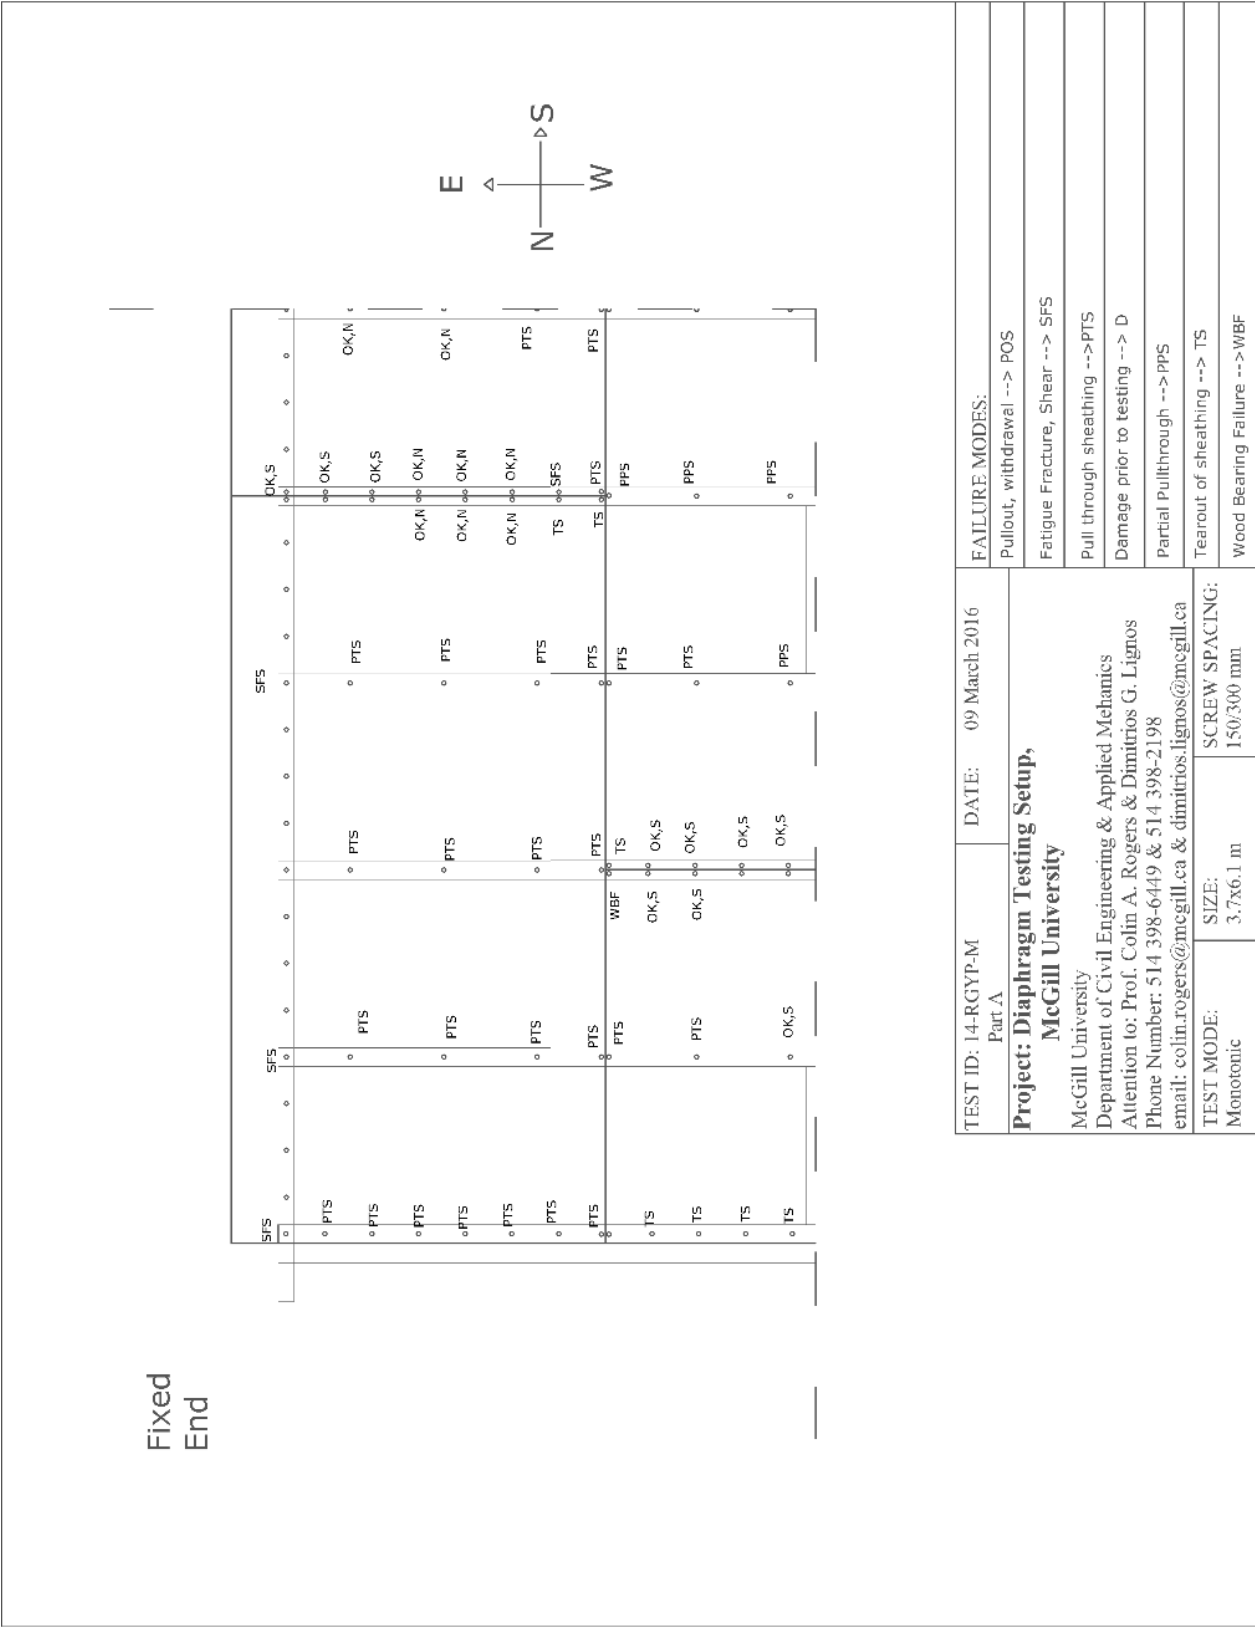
Sheathing Fastener Failure Modes Part A Specimen 14-RGYP-M
